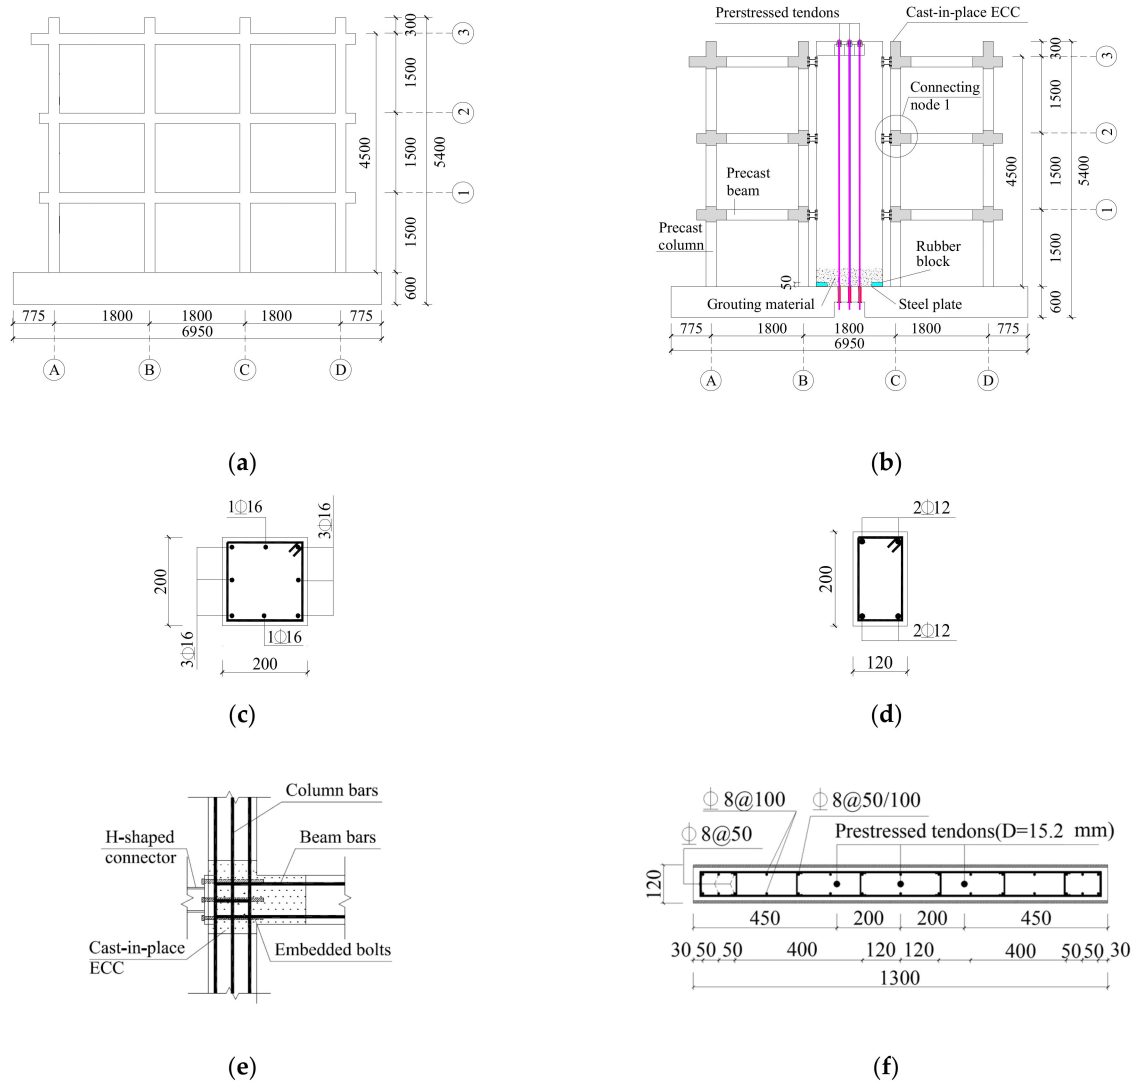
Test specimen dimensions and reinforcement (unit: mm). (a) Geometry of CF; (b) Geometry of PFRW; (c) frame column; (d) frame beam; (e) typical cast-in-place beam-column connection (connecting node 1); (f) rocking wall.
